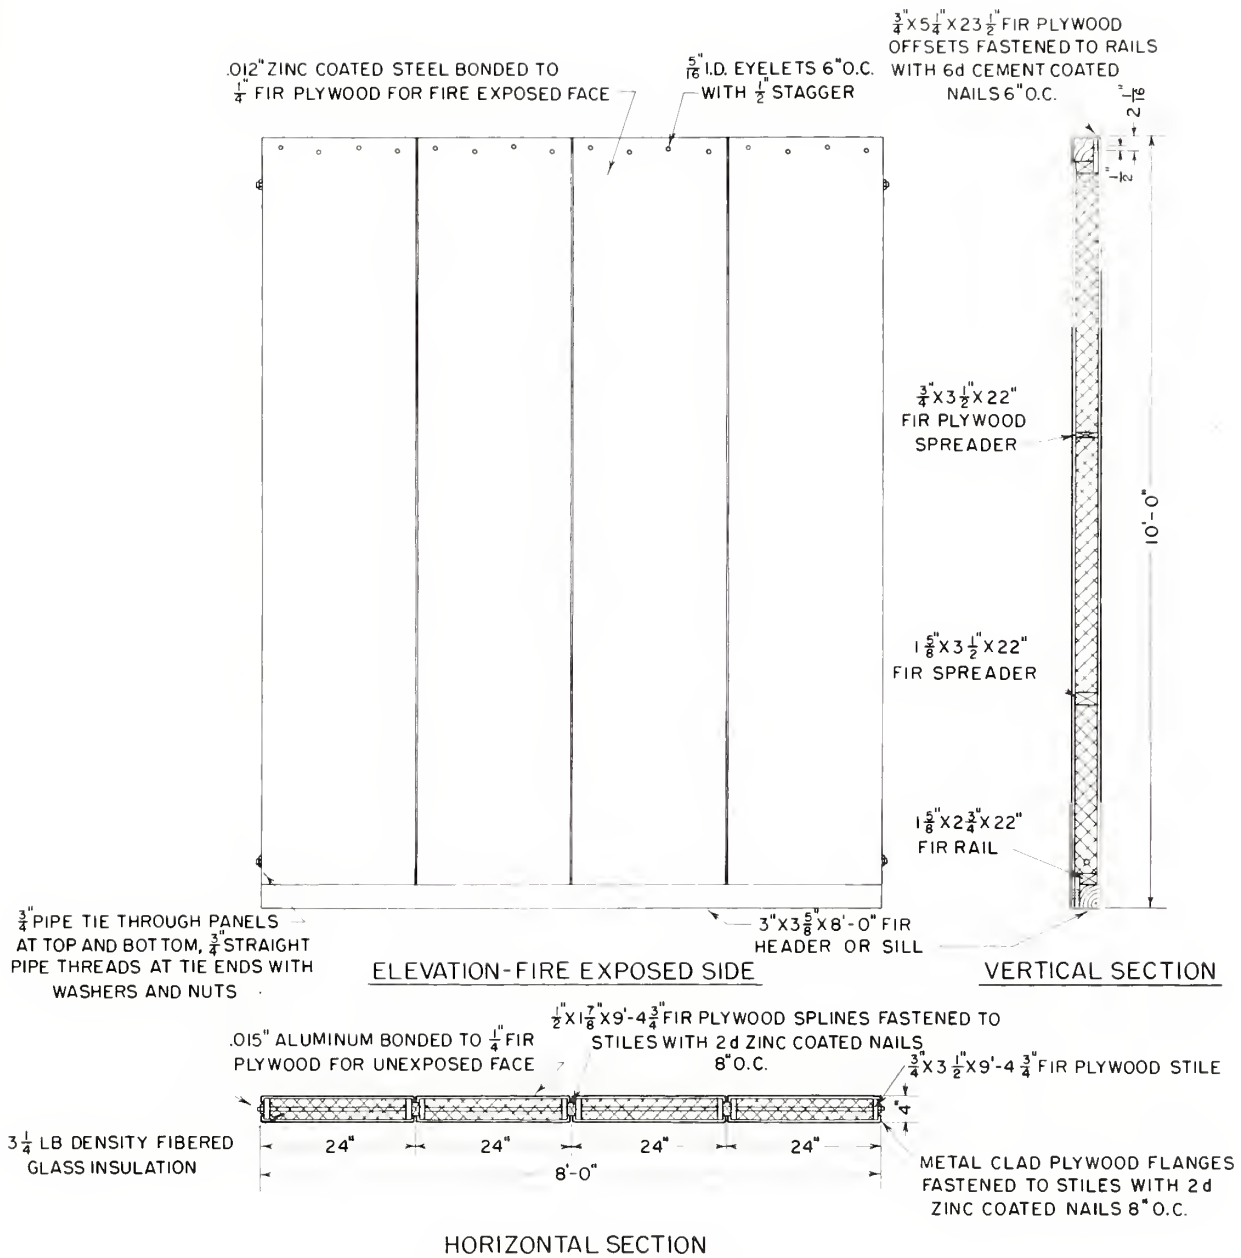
CONSTRUCTION DETAILS OF TEST PANEL NO. 4
